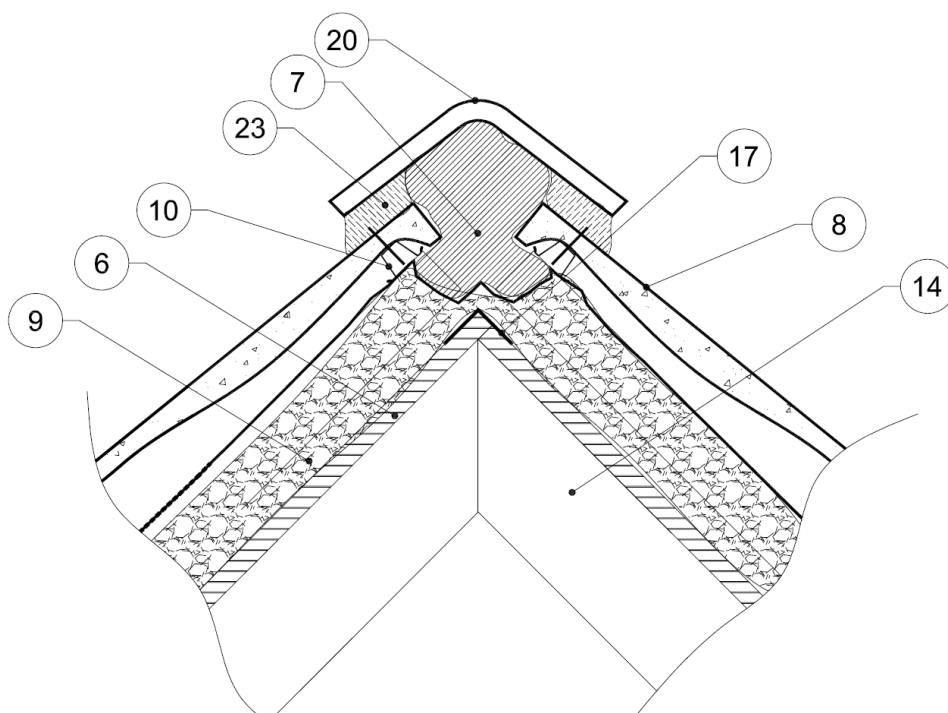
Example of Barge and Gable Detail (Section E-E)
